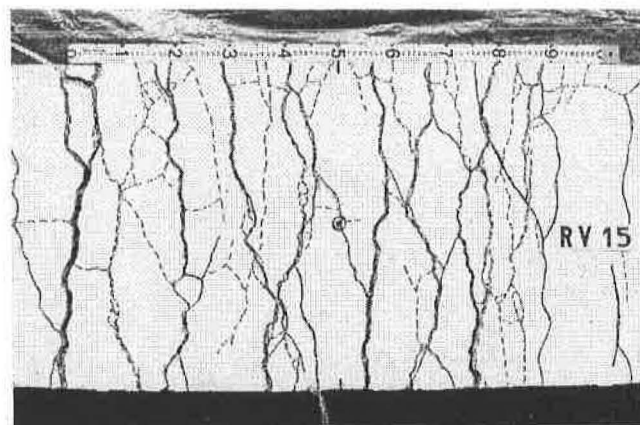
Final crack pattern of specimen RV15. Top view.
